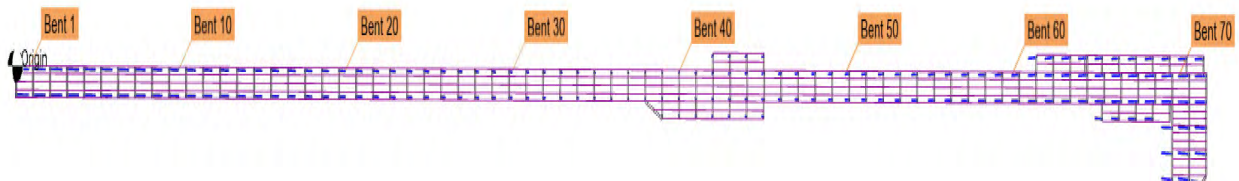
Plan view of Flinders Pier SpaceGass model
